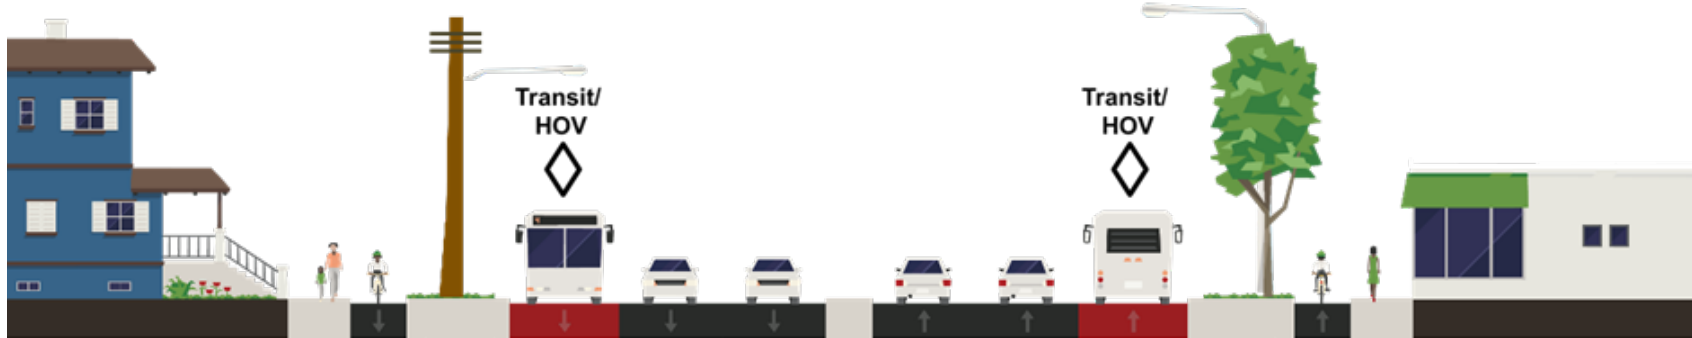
Alternative 1 - Sidewalk and Cycle Track in each Boulevard
